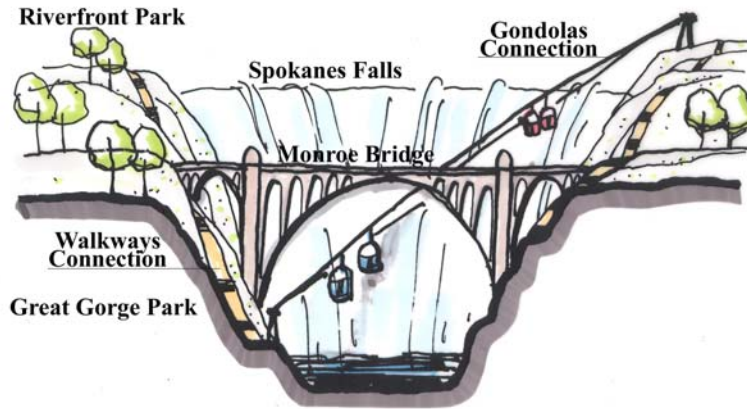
Cross Section of Proposed Great Gorge Park Entry Area, Connected to Riverfront Park with Gondolas and Walkways.
